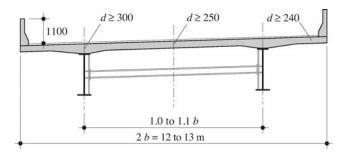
Dimensions of the slab of a composite road bridge with two main beams.
